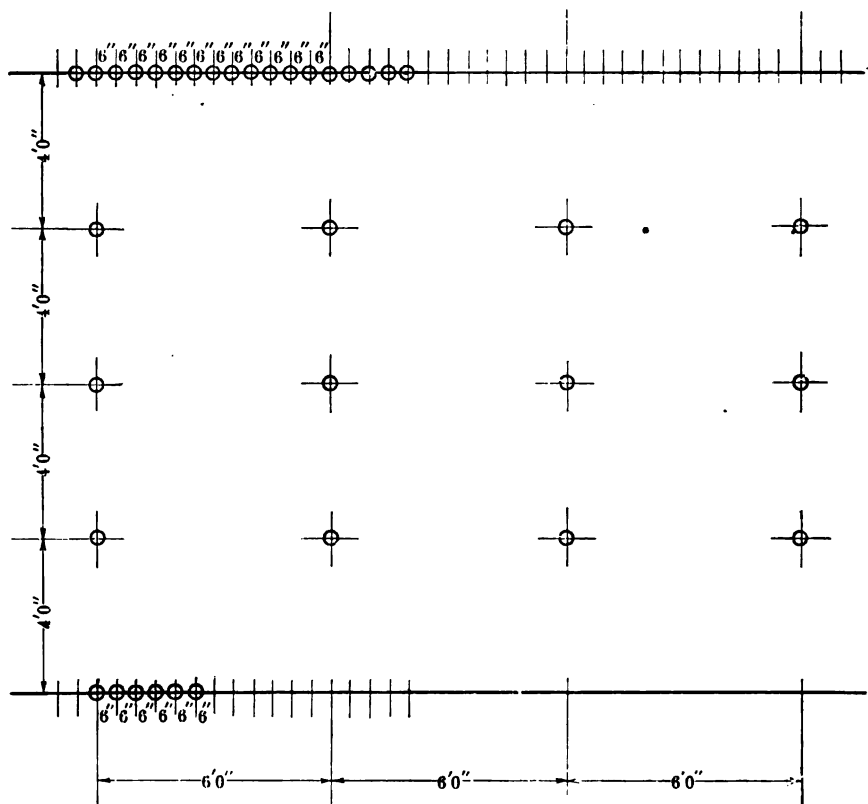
APPROXIMATE SPACING OF HOLES IN TRENCH FOR DAM FOOTING.
